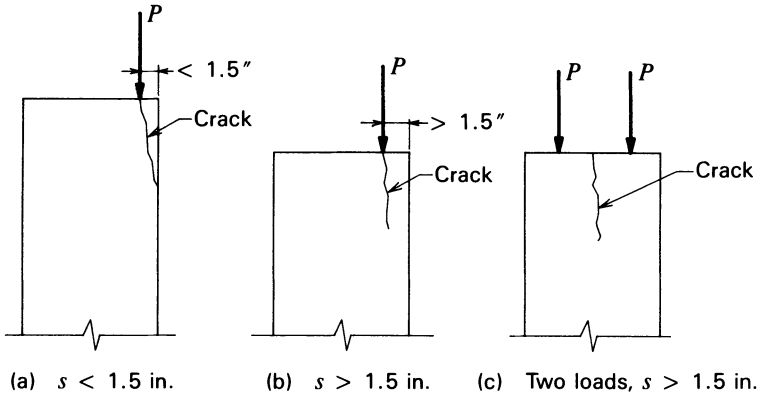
Modes of failure for reinforced concrete column heads.
